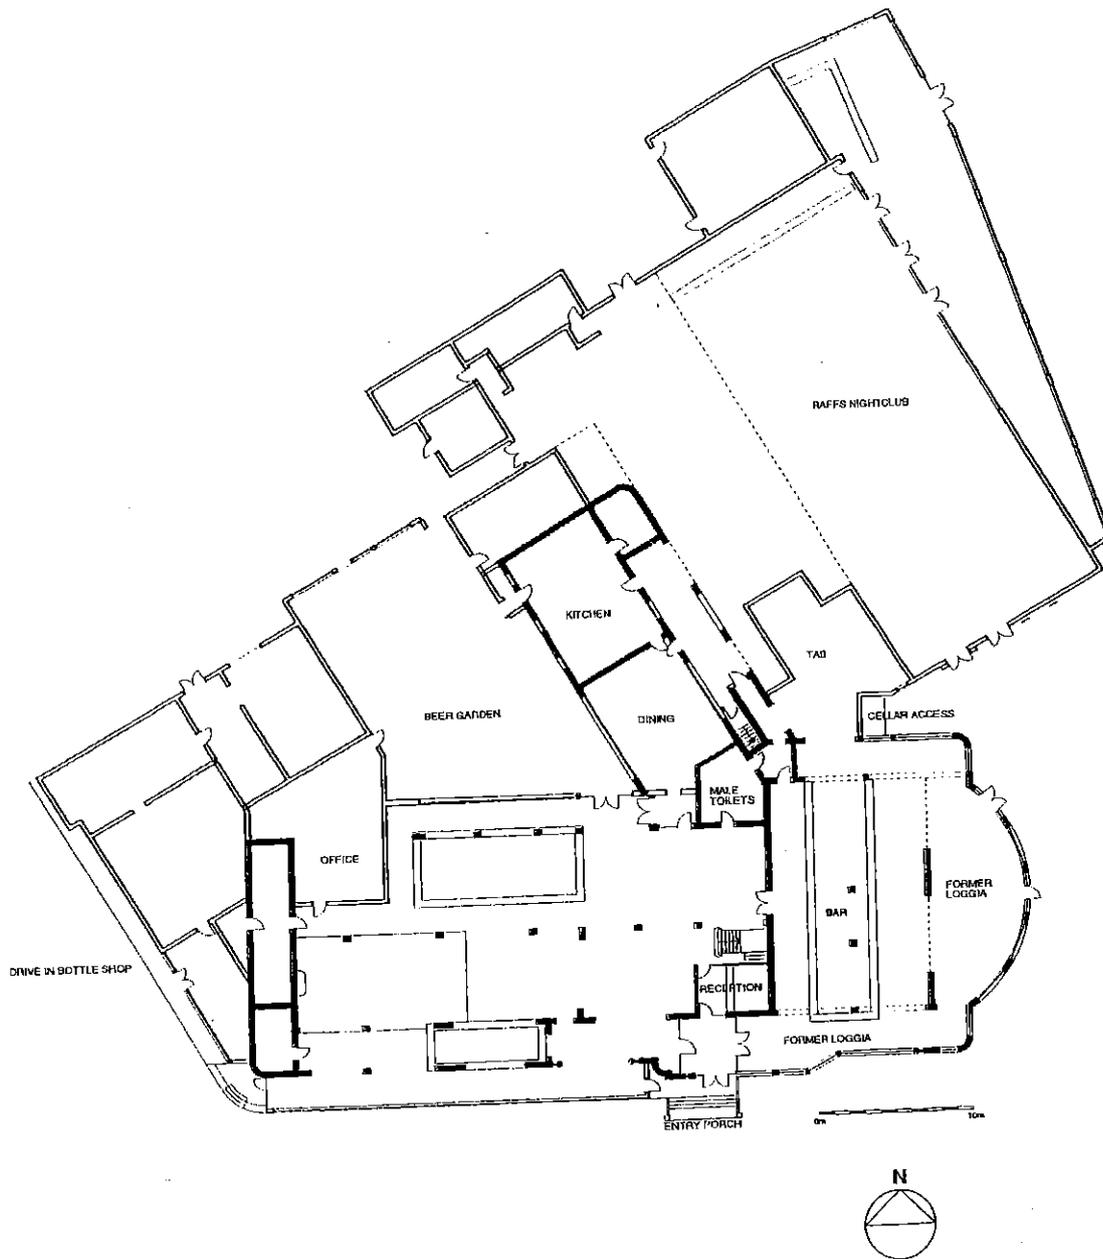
Sketch plan of ground floor of Raffles Hotel 'heritage' core. From Palassis Architects' draft Conservation Plan, August 2001.
